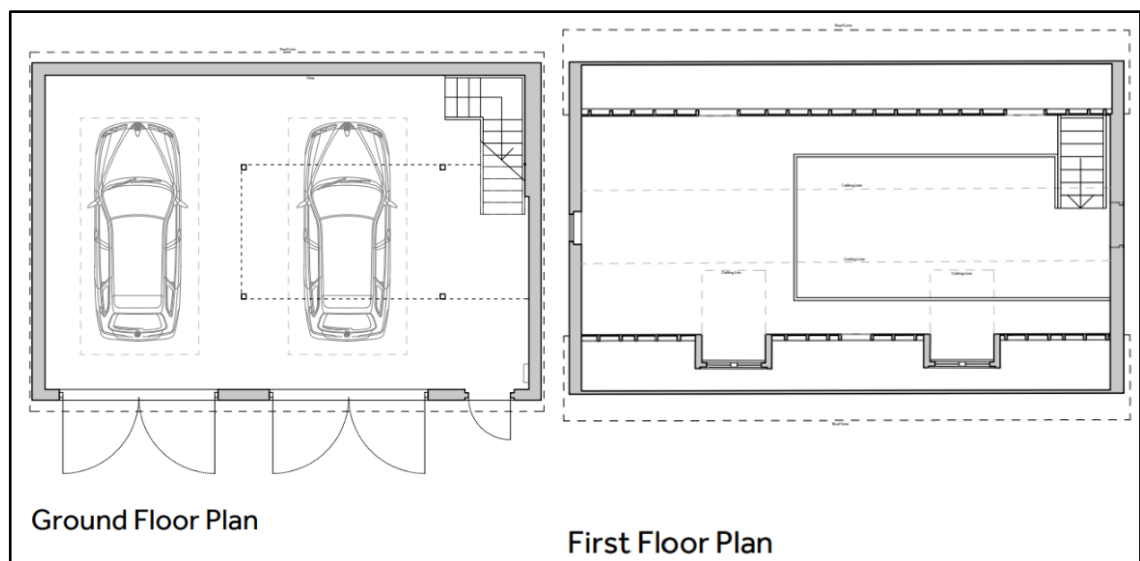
PROPOSED GARAGE FLOOR PLANS (CLAGUE ARCHITECTS)
